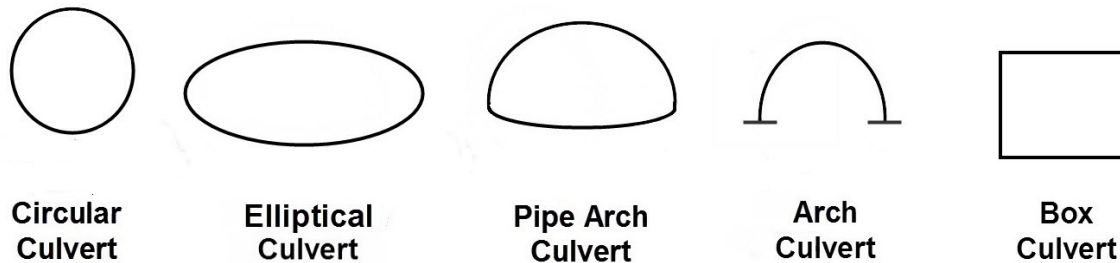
Corrugated Galvanized Steel Culvert Shapes
